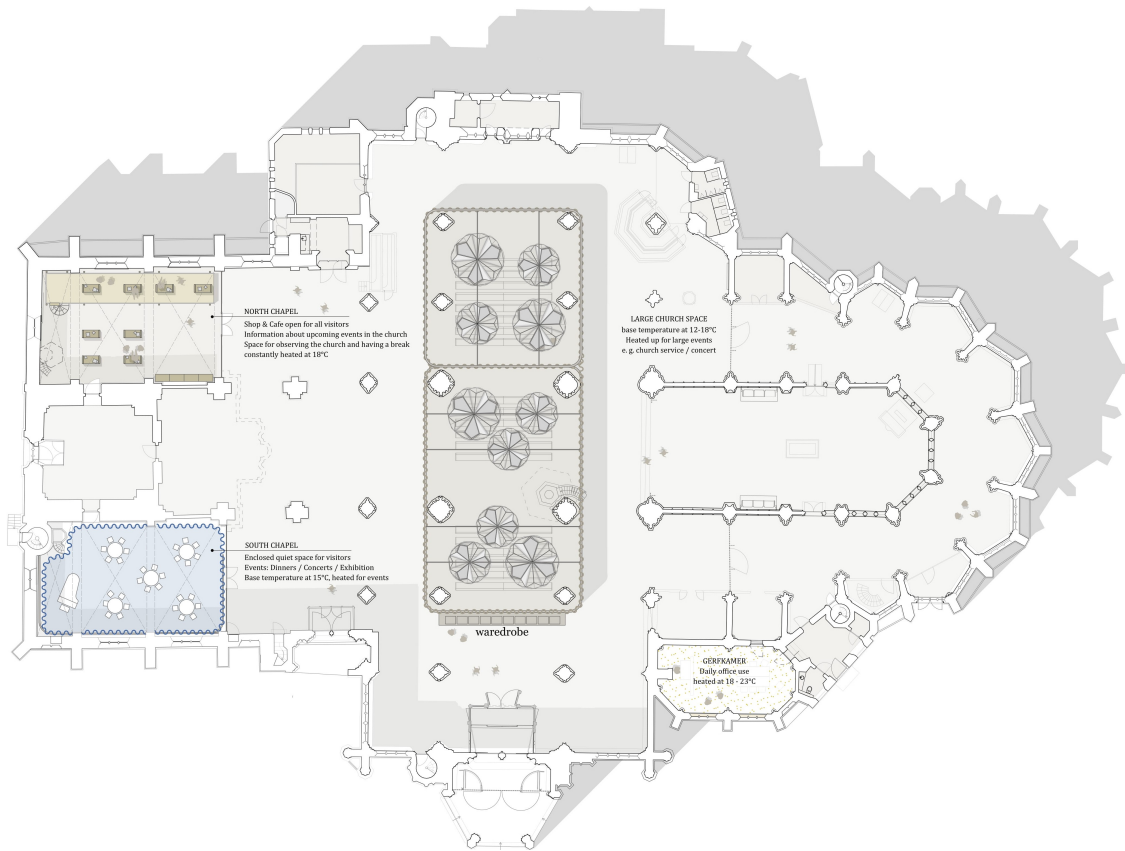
Floorplan Stevenskerk renovation proposal - Step 1
